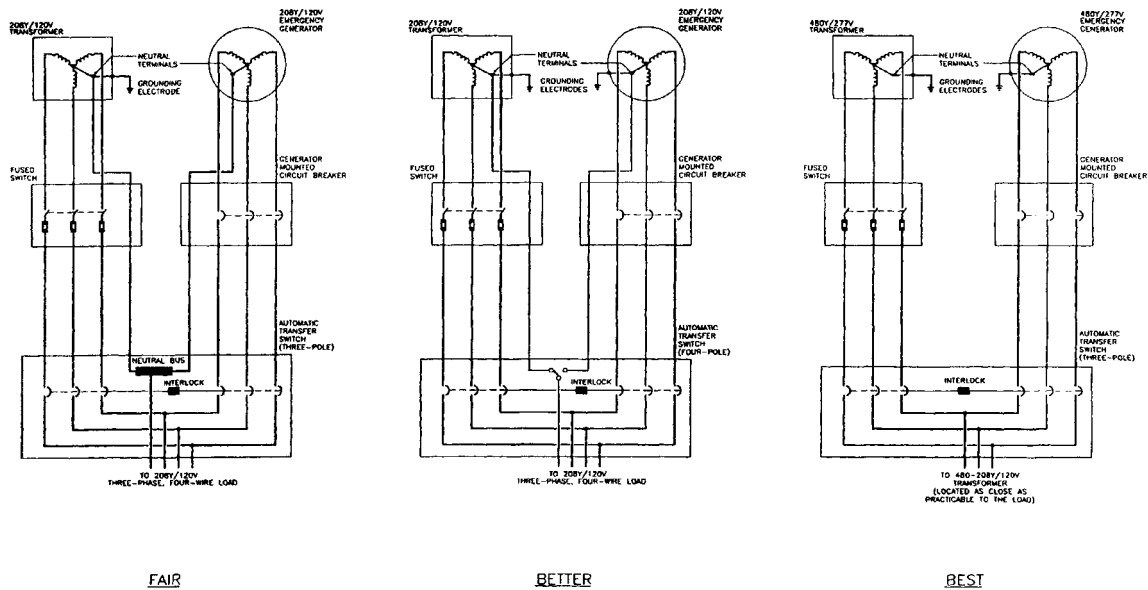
Recommended transfer switch arrangement serving electronic load equipment
